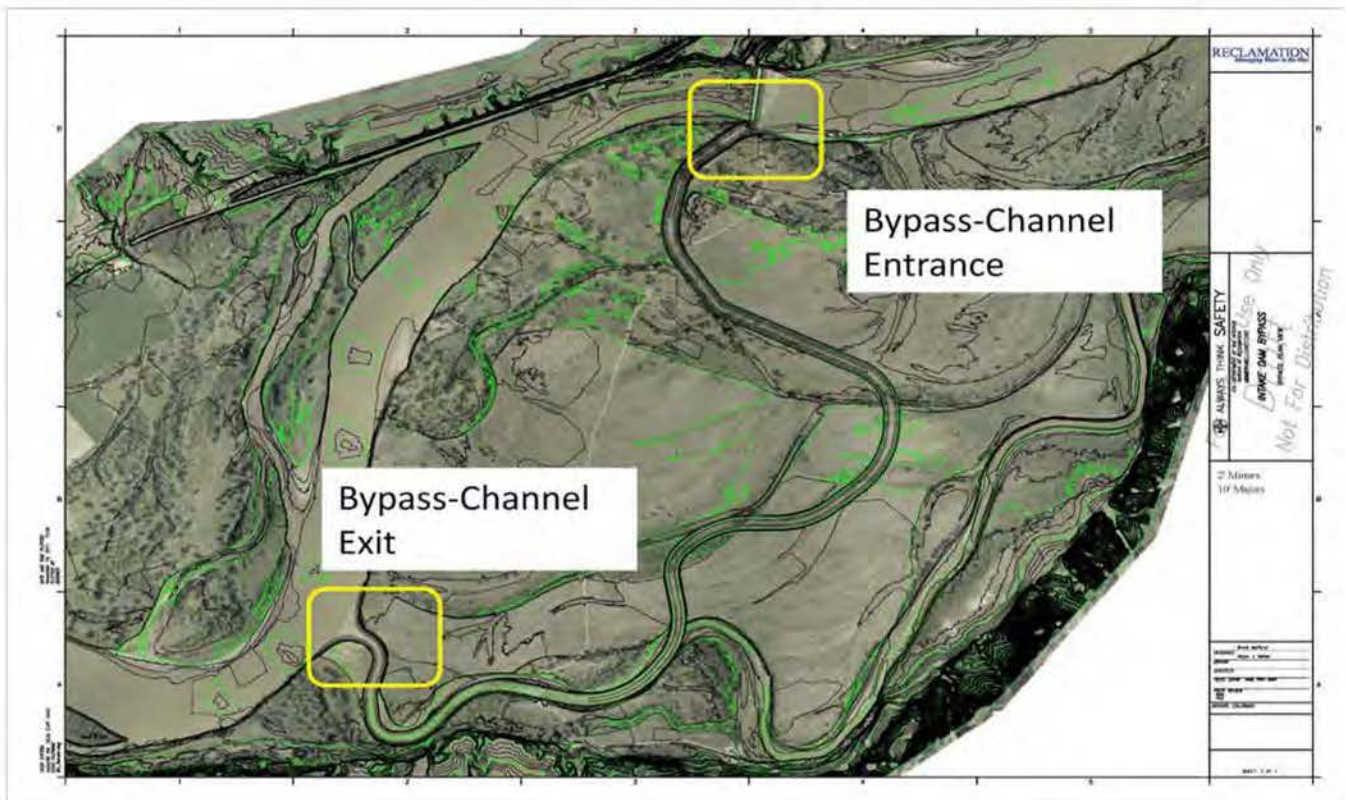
Preliminary split-channel bypass design showing passage entrance and exit locations.
